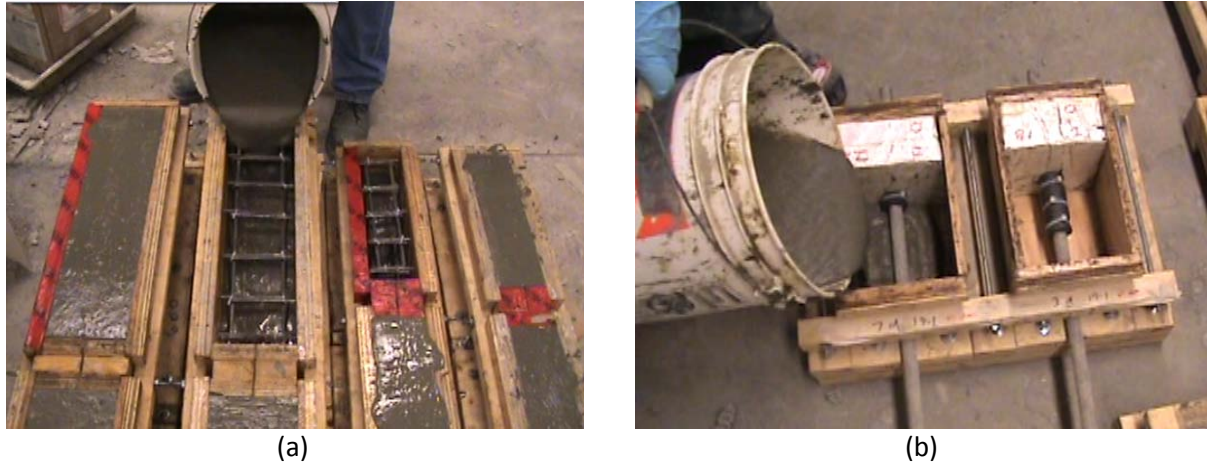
Bond test specimen casing with Ductal®: (a) beam test specimen; (b) pullout test specimen.
